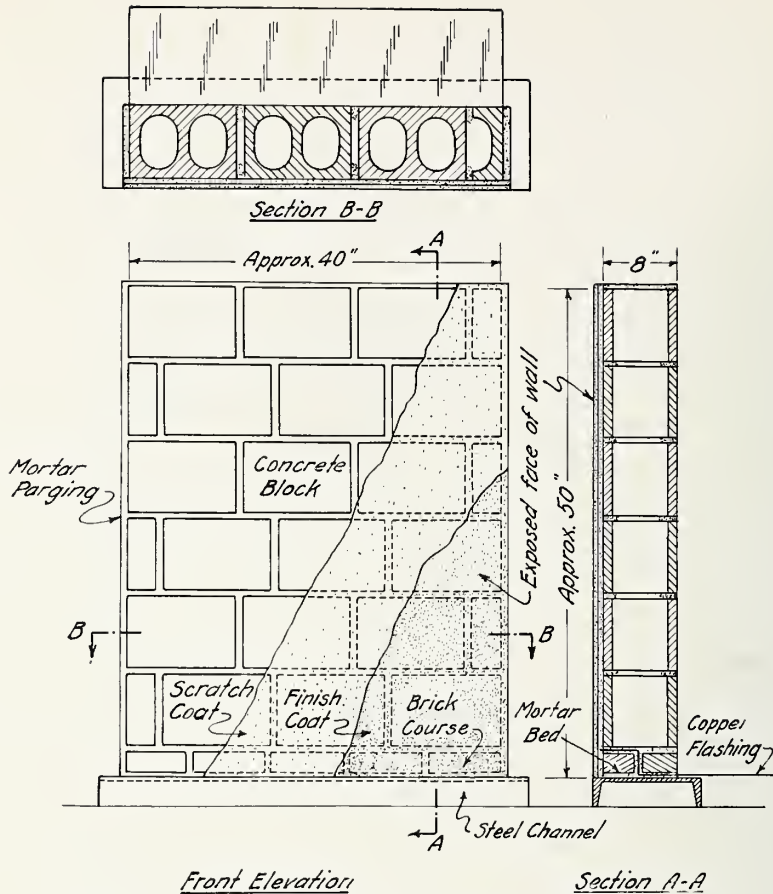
Typical stucco-faced wall with concrete block backing.
